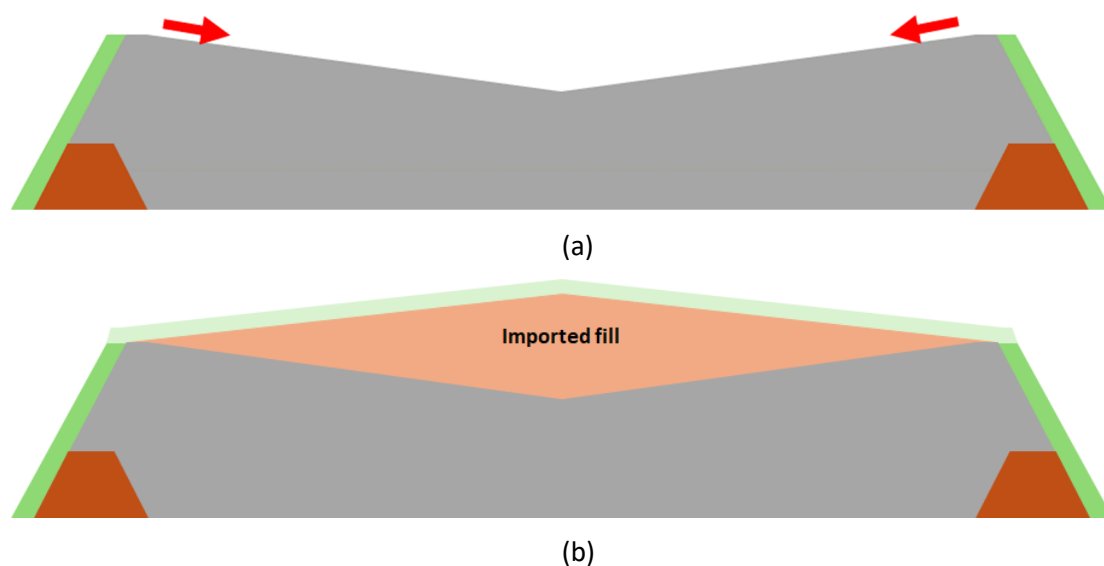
Typical section through a tailings storage facility showing: (a) Discharge from the perimeter; (b) The resulting volume of imported fill required
